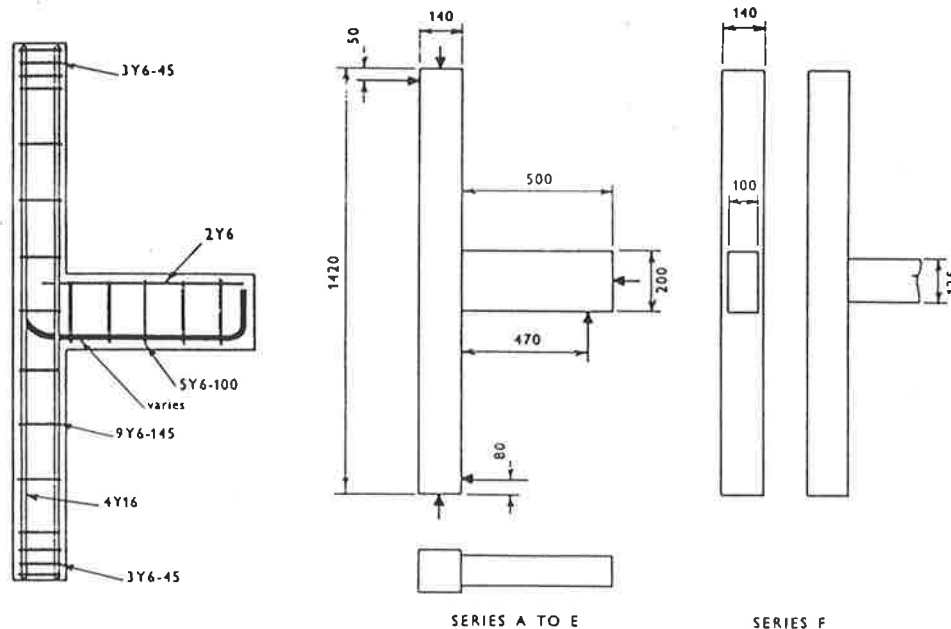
Test configuration and detailing used by Taylor (1974)
